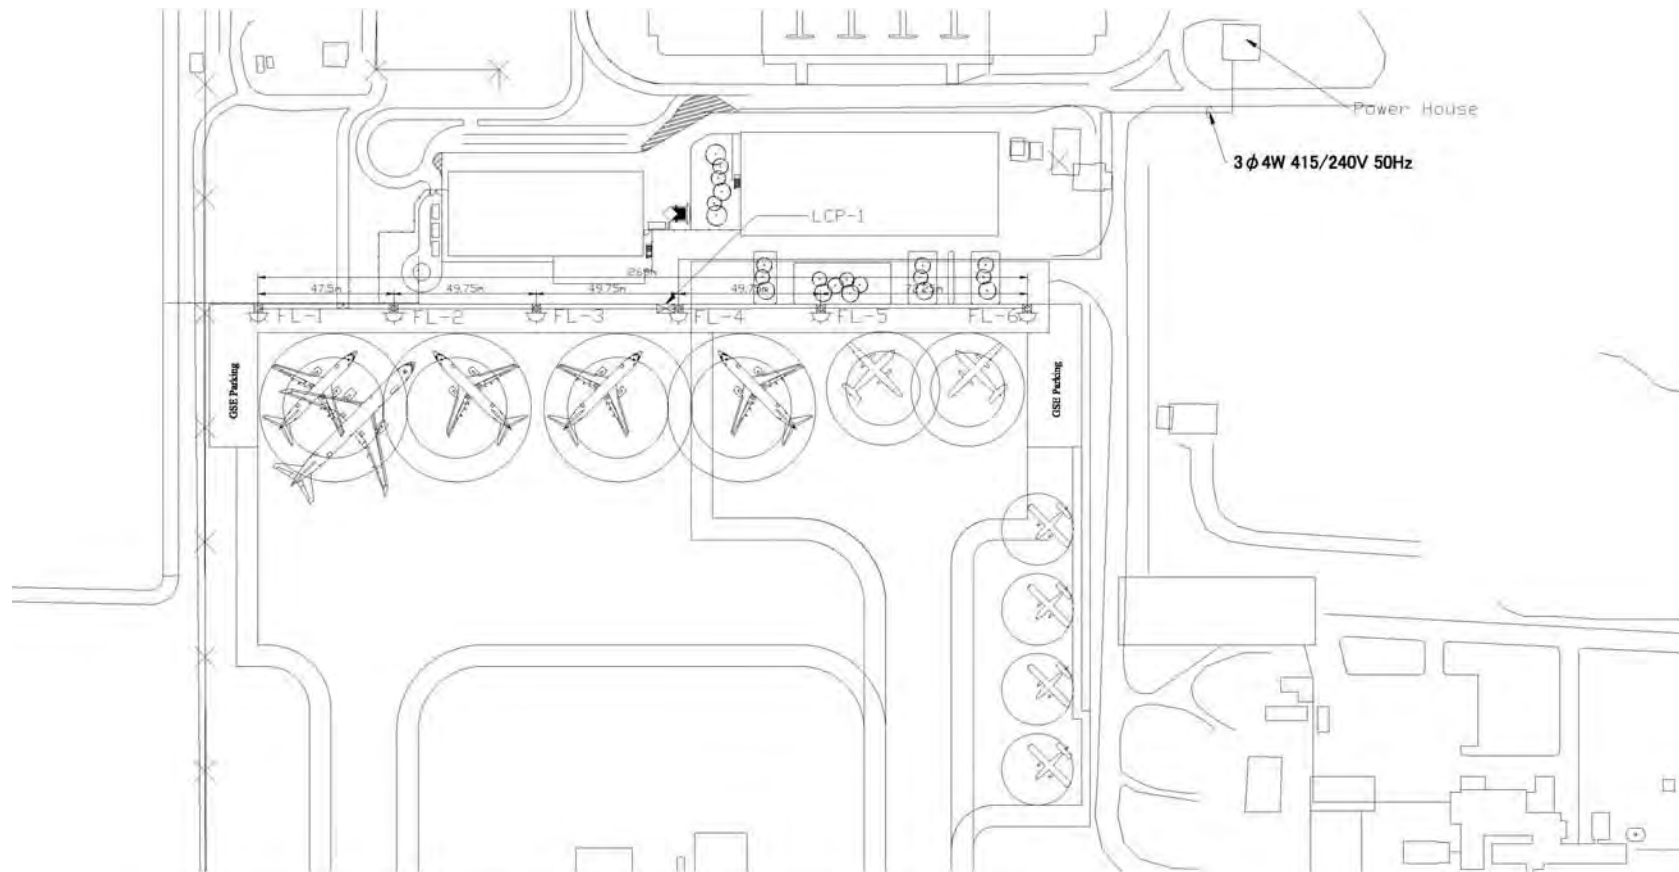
Airfield Lighting Layout Plan (Taxiways)
